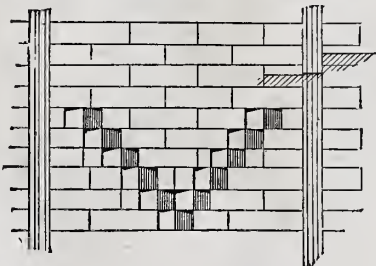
Panel for Blind Window, South Side, Second Story.—Scale, 1/2 Inch to the Foot. Recessed Bricks are No. 20.
